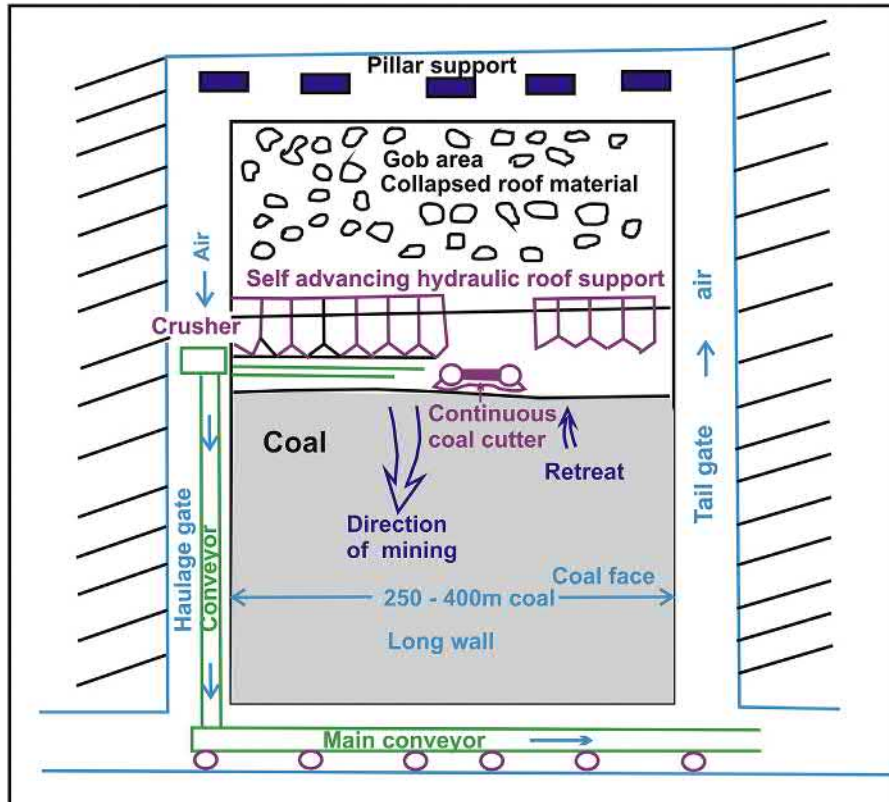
A general layout of long wall advancing with highly mechanized large production and simultaneous backfilling support system for coal and lignite deposits.
